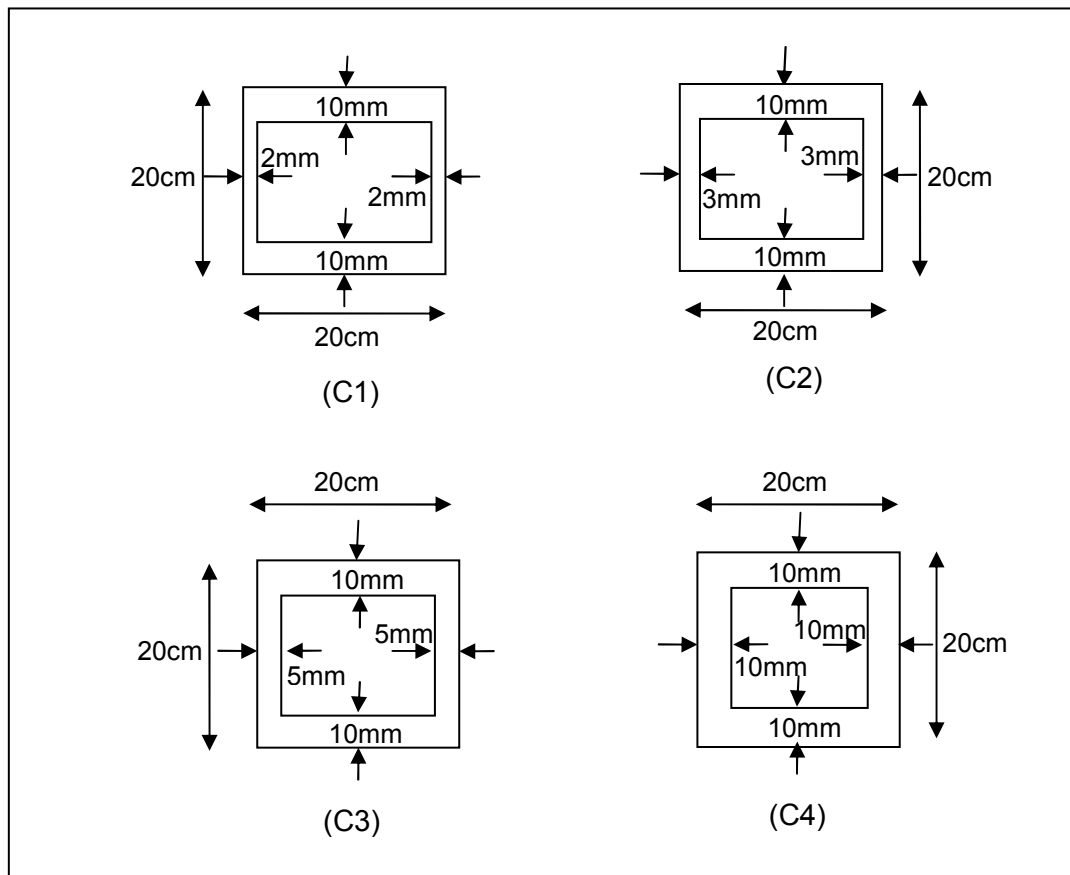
Cross sections of the steel culvert models used in shaking table tests
